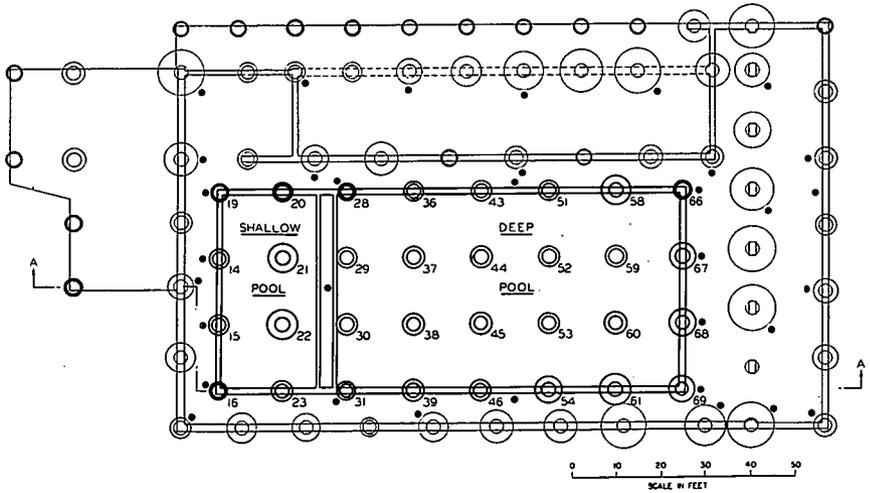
PLAN OF BUILDING SHOWING CAISSON LAYOUT; THE POOL SECTION SHOWN BY HEAVY LINES; LOCATIONS OF SETTLEMENT PLUGS SHOWN BY HEAVY DOTS.
